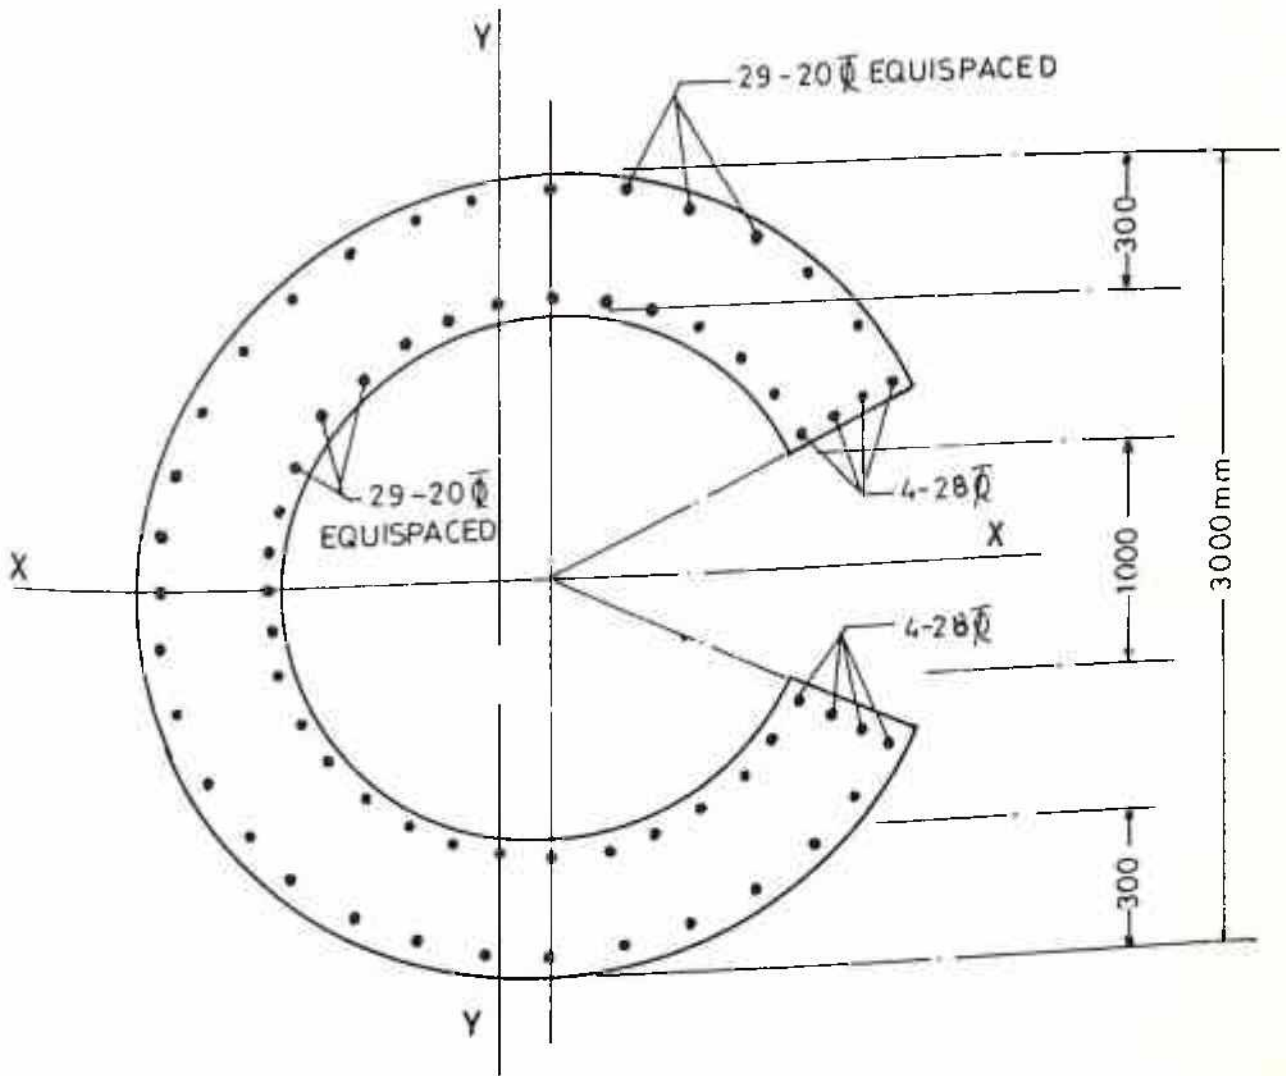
DESIGN EXAMPLE OF CIRCULAR CEE COLUMN SECTION
